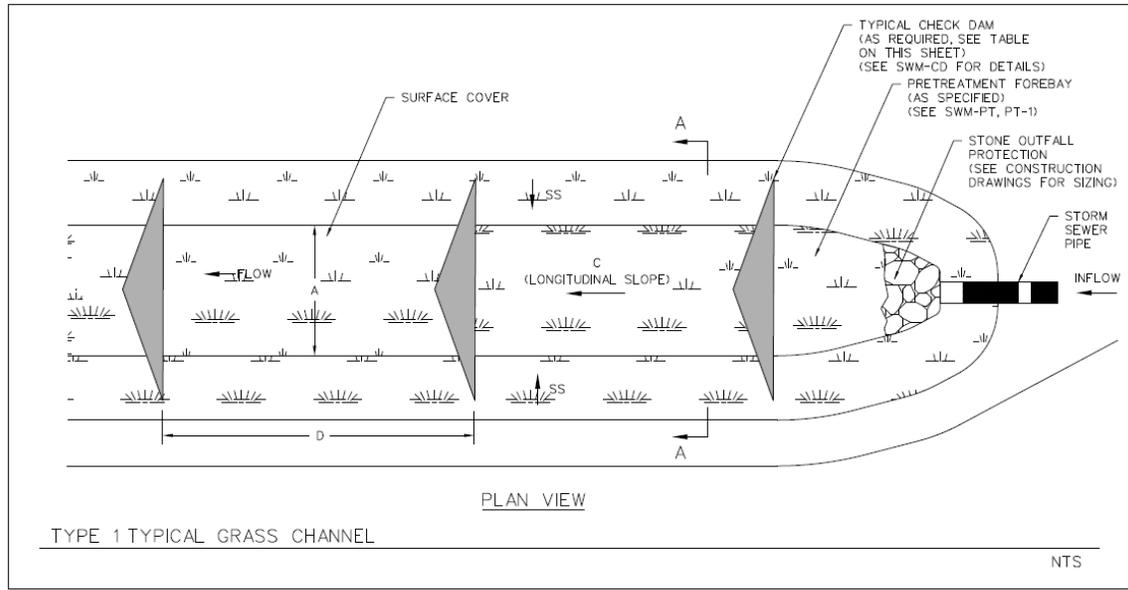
Schematic Grass Channels - Typical Plan
